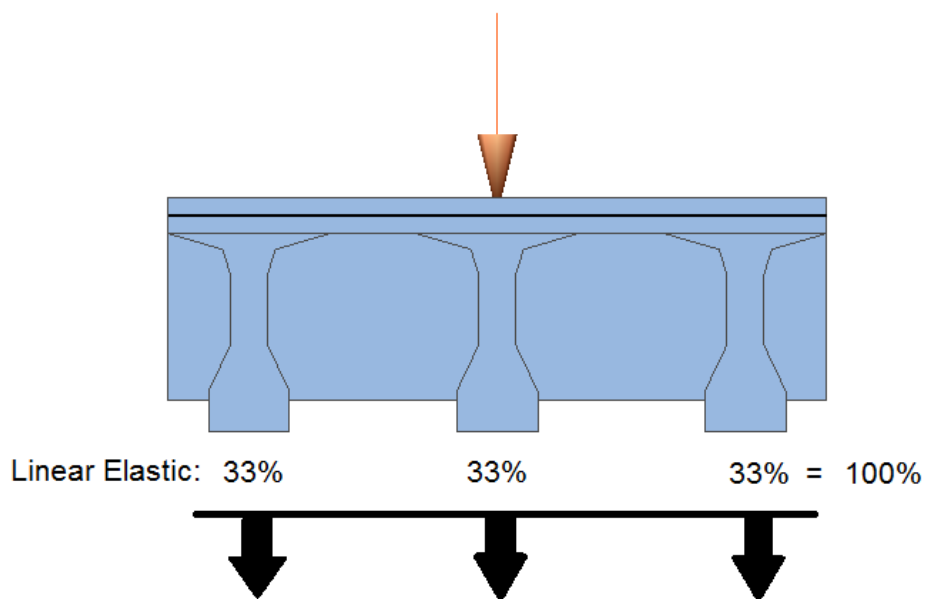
bridge with crossbeams, and with the load at 2.25 m
